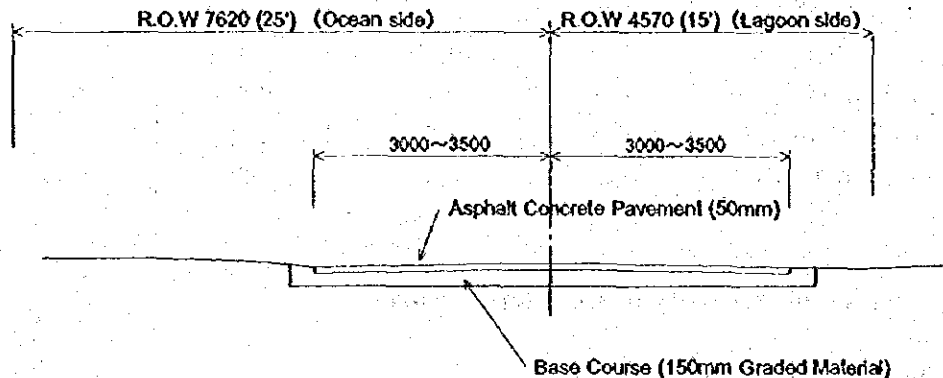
TYPICAL CROSS SECTION OF THE EXISTING ROAD
